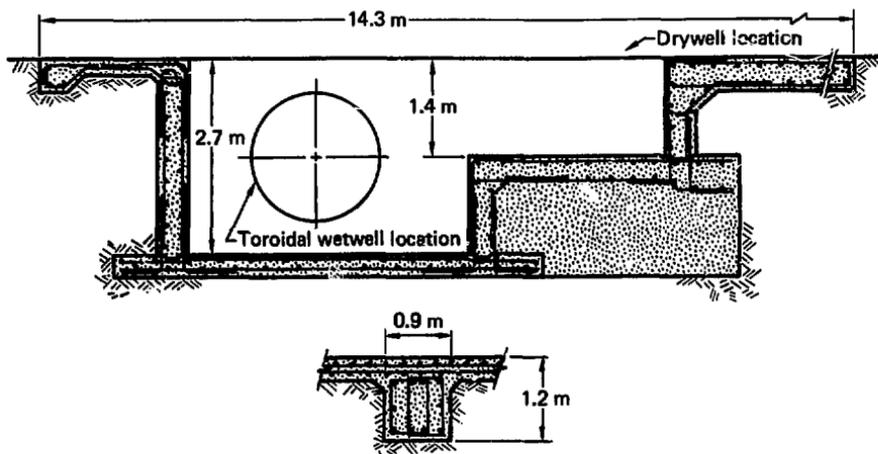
Cross section of test facility pit and concrete beam below toroidal wetwell main supports.
